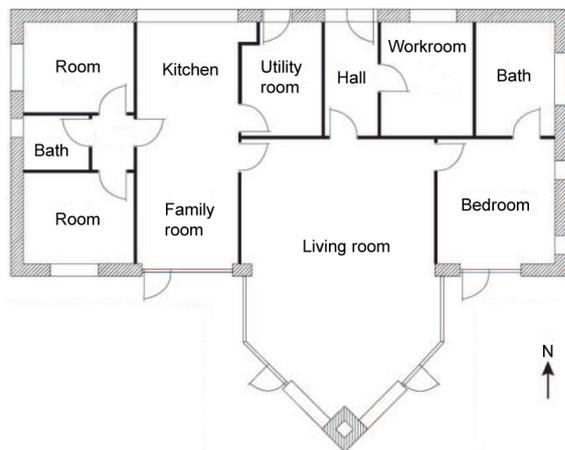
Sketch of modelled residential building in shape of a single-family detached house (Aggerholm and Grau, 2007).
